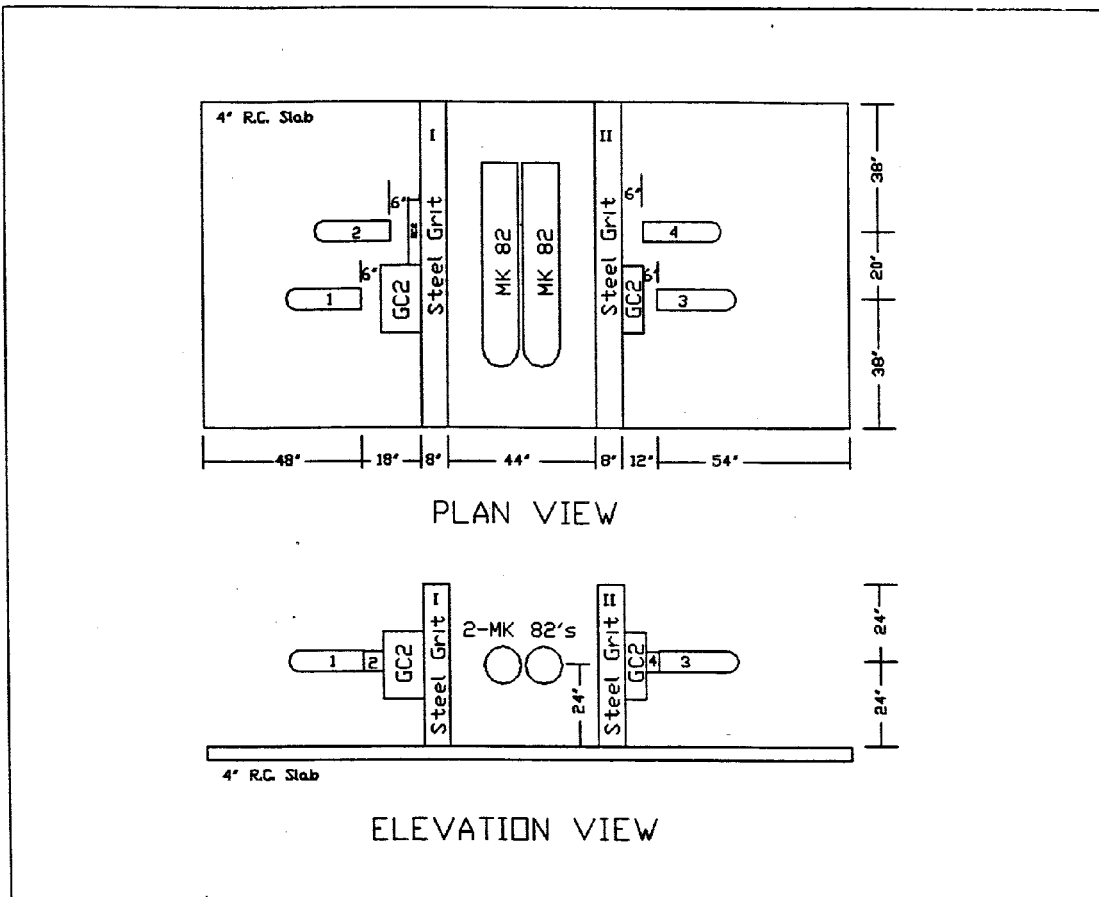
One-Third Scale Cell Wall Test #1 Setup
